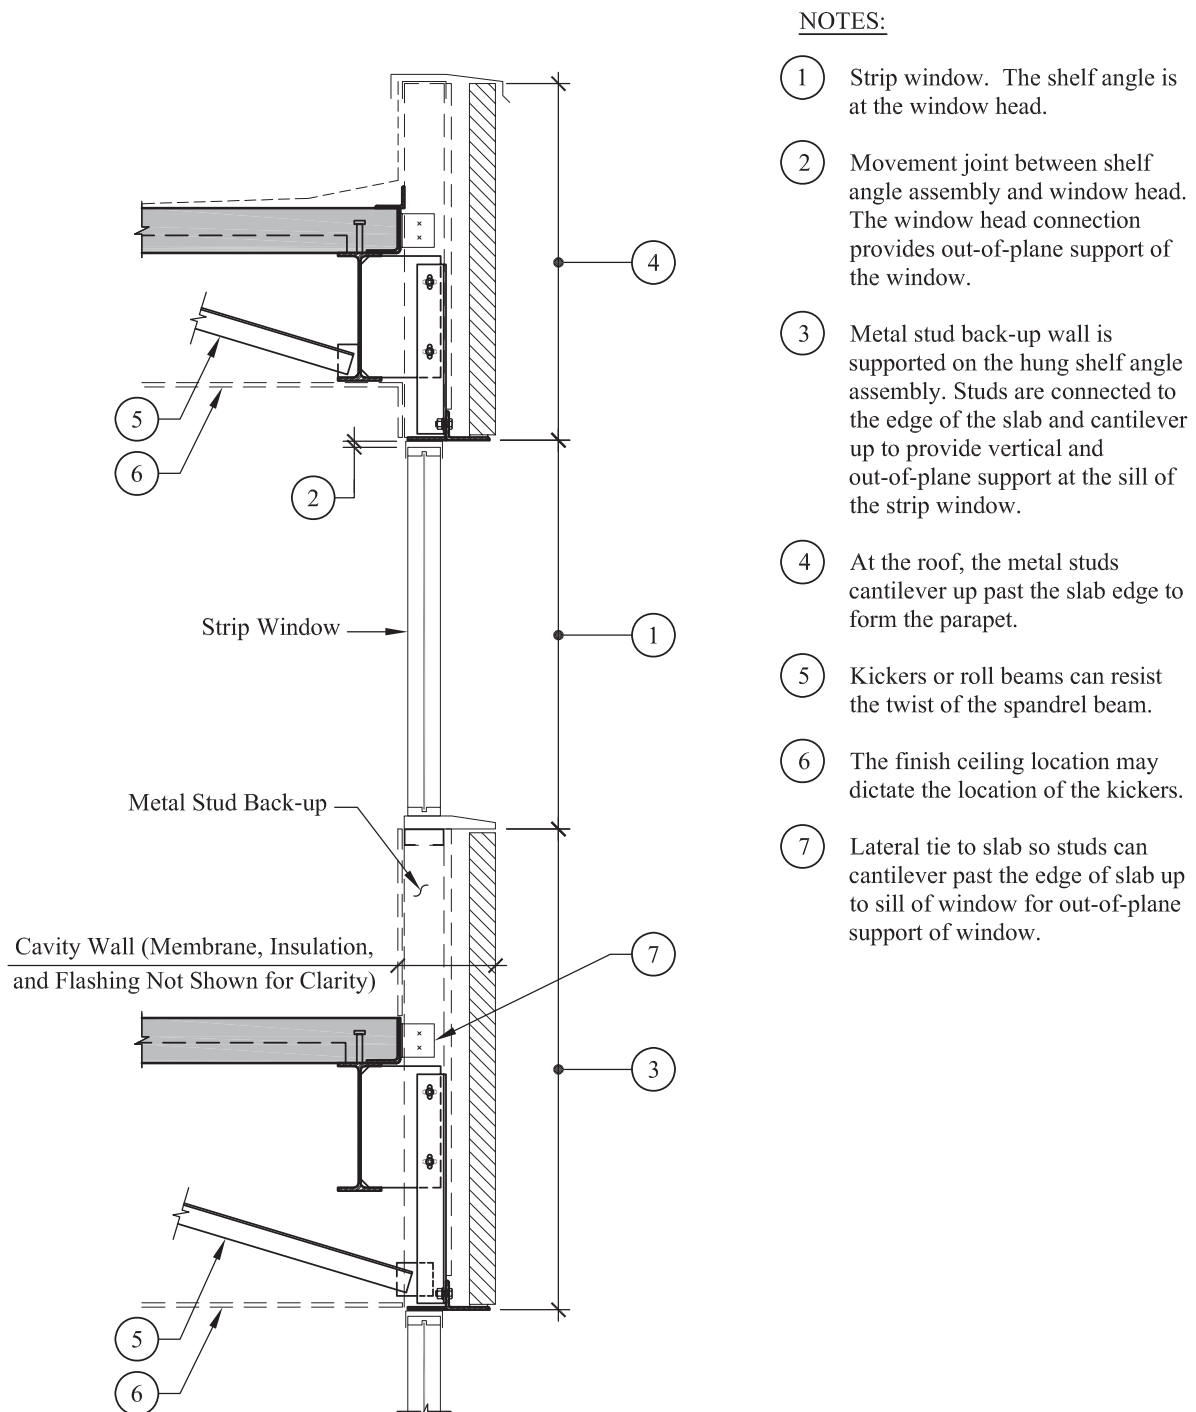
Wall section with hung shelf angle and strip windows (back-up runs past slab edge).
